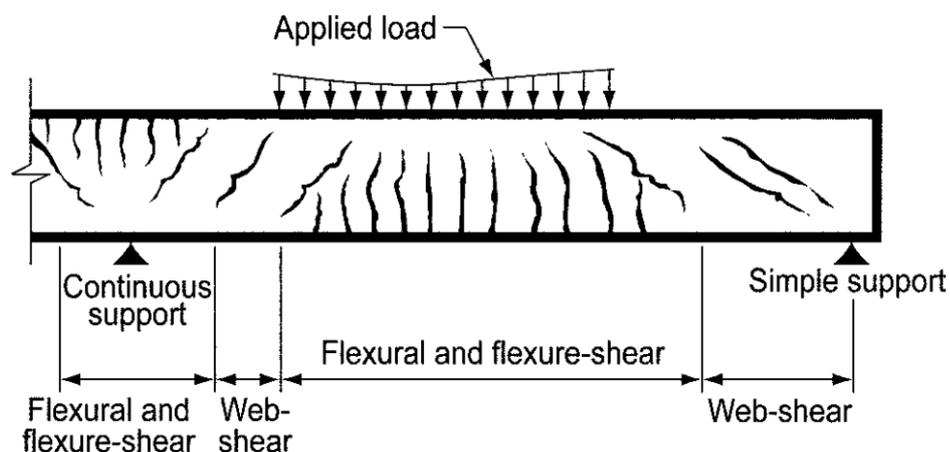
Different types of cracks in prestressed RC beam [7]
